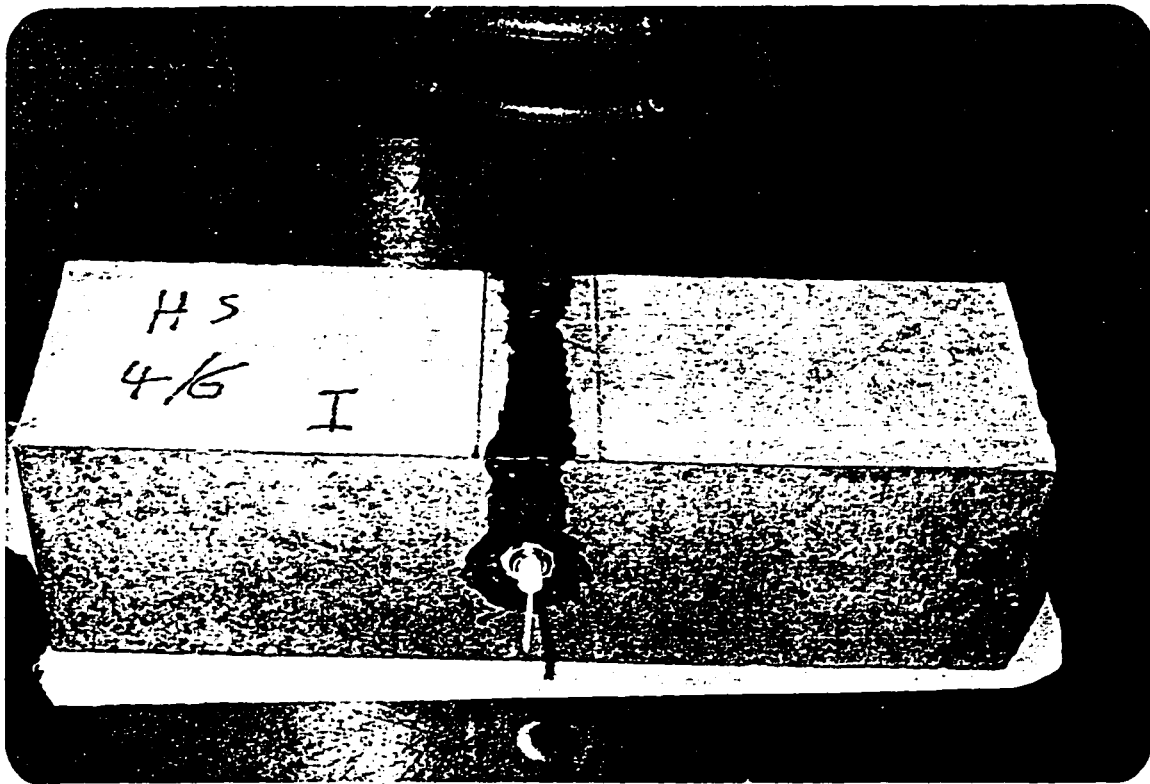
A beam specimen after sealing the crack and before epoxy injection.
